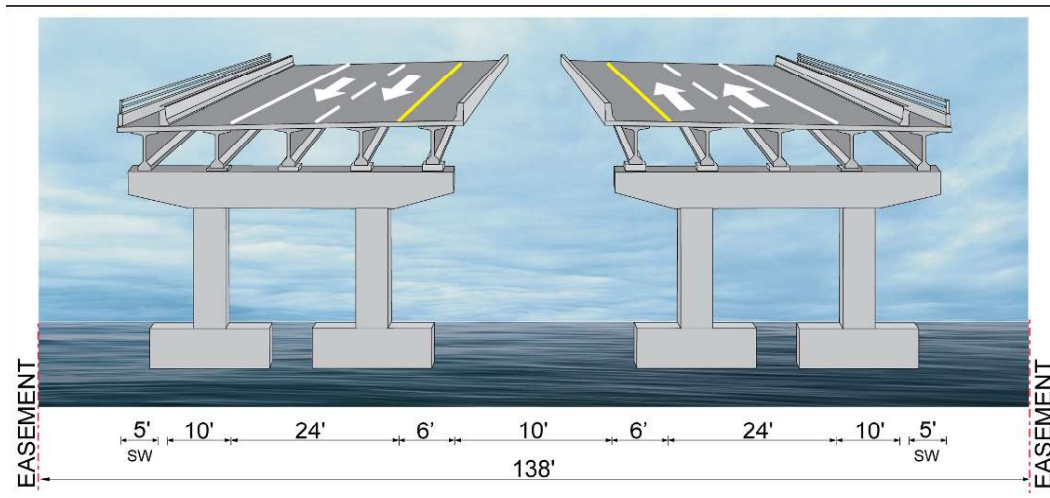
Two-lane typical section for the fixed span bridge at Rye Road.
